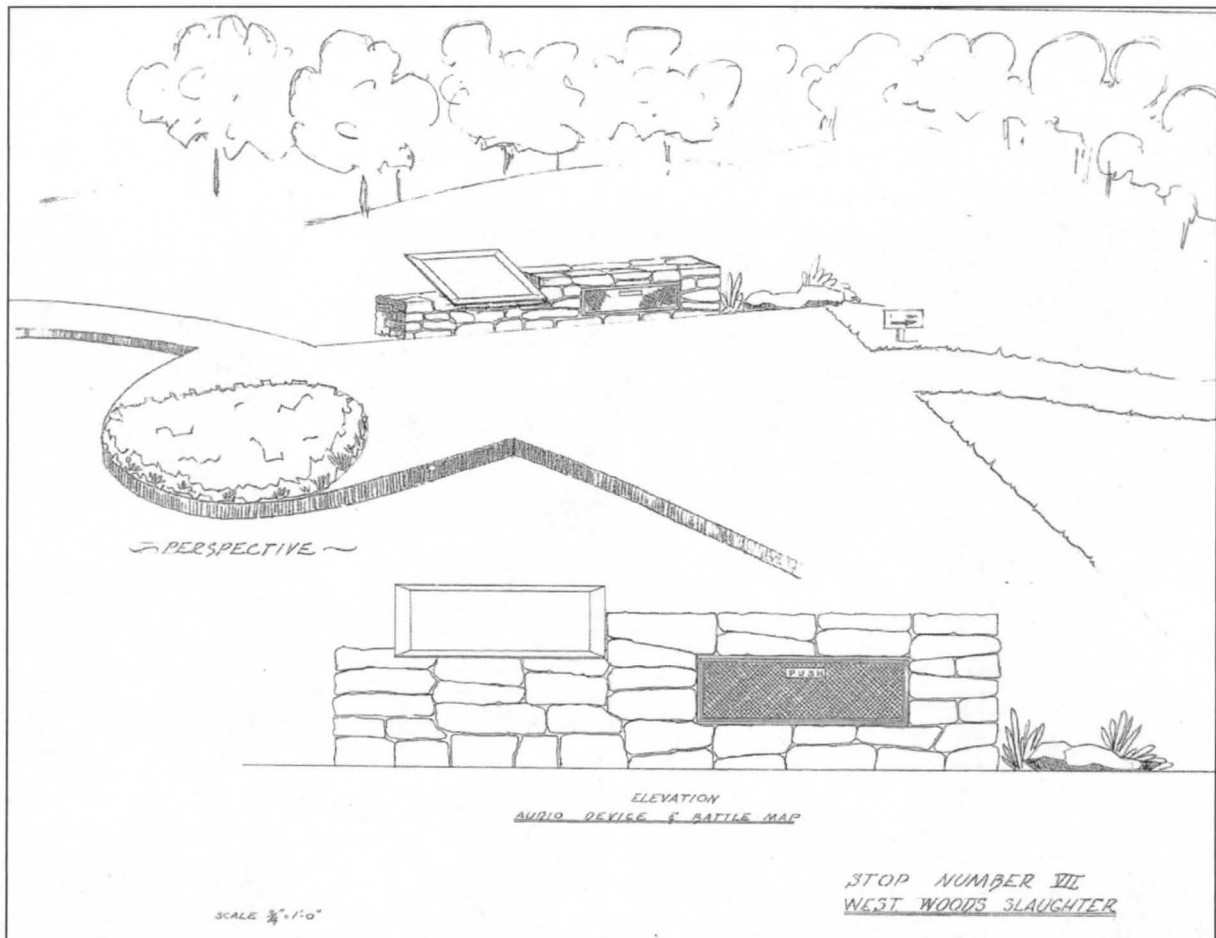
Plan for the West Woods Slaughter Interpretive Exhibit at Philadelphia Brigade Park from the 1961 “Sign and Exhibit Wayside Plan.” Source: National Park Service.
